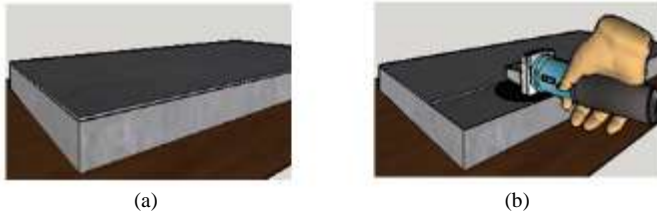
(a) mark the layer to be grinded of 4mm thickness (b) grinding bit by bit until the mark has been made
